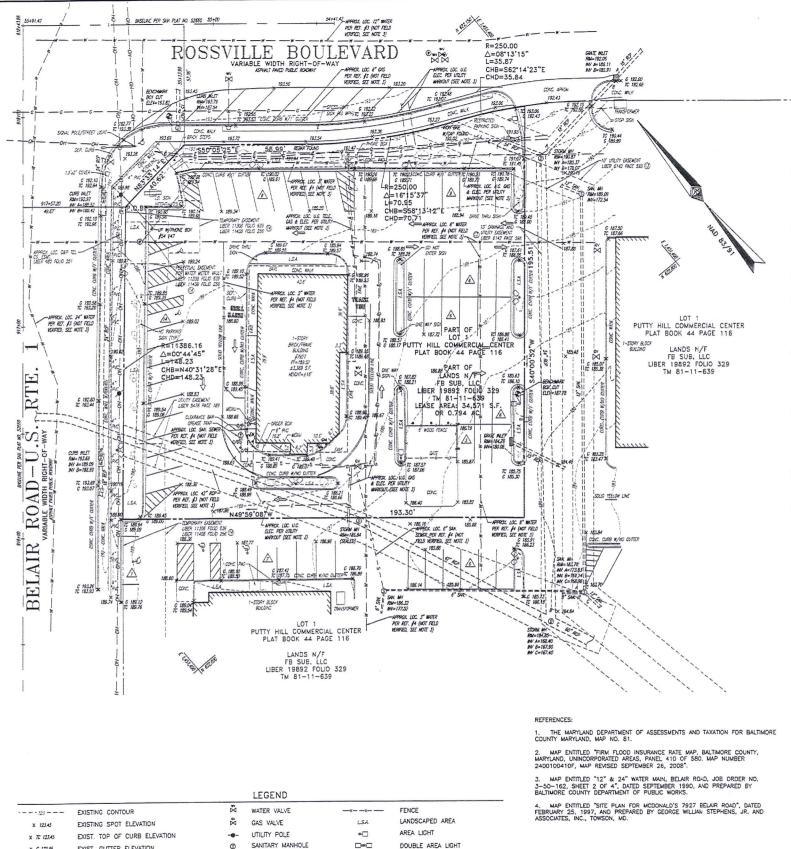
ALTA SURVEY – EXISTING CONDITIONS
